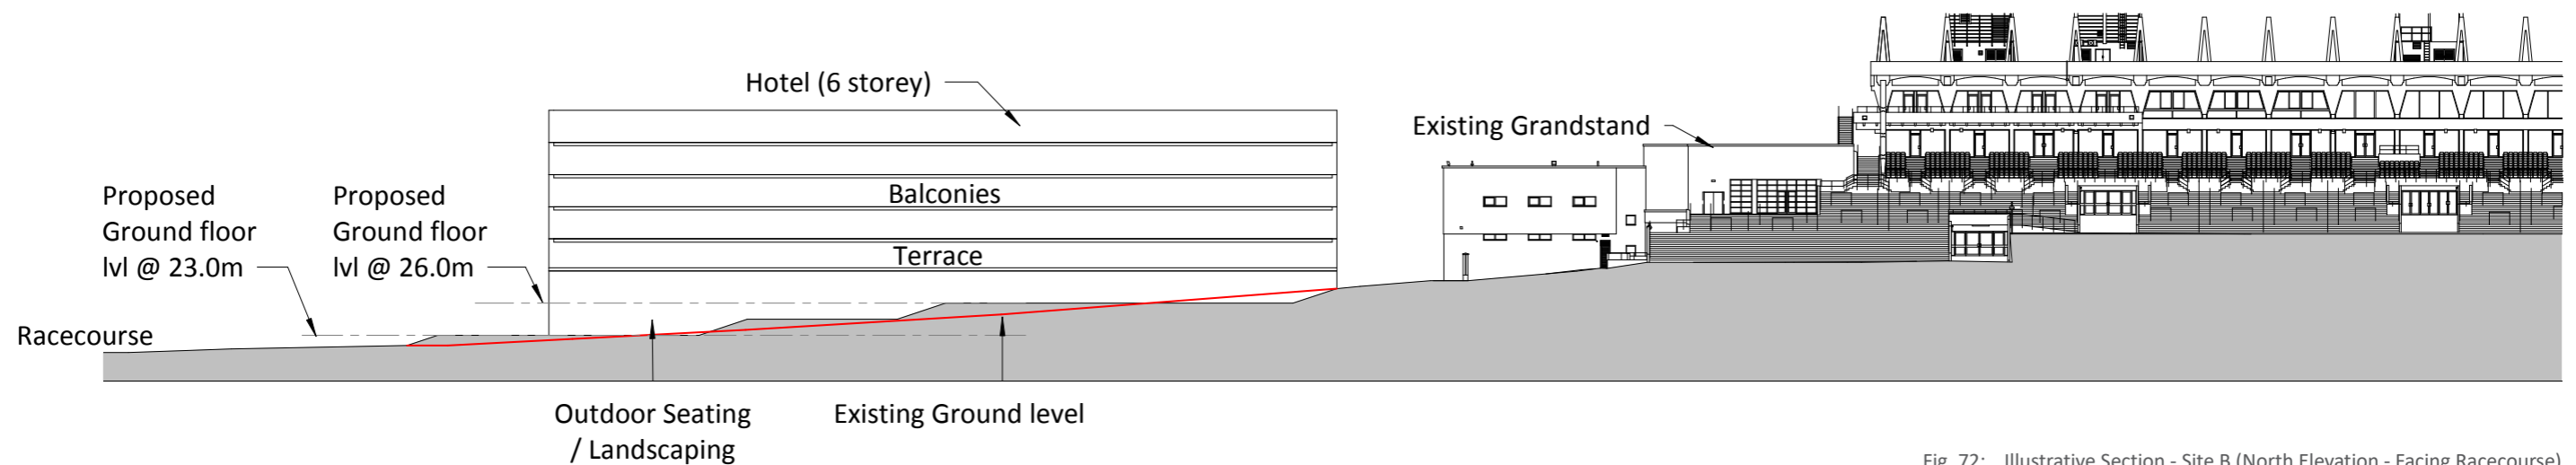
Illustrative Section - Site B (North Elevation - Facing Racecourse)
